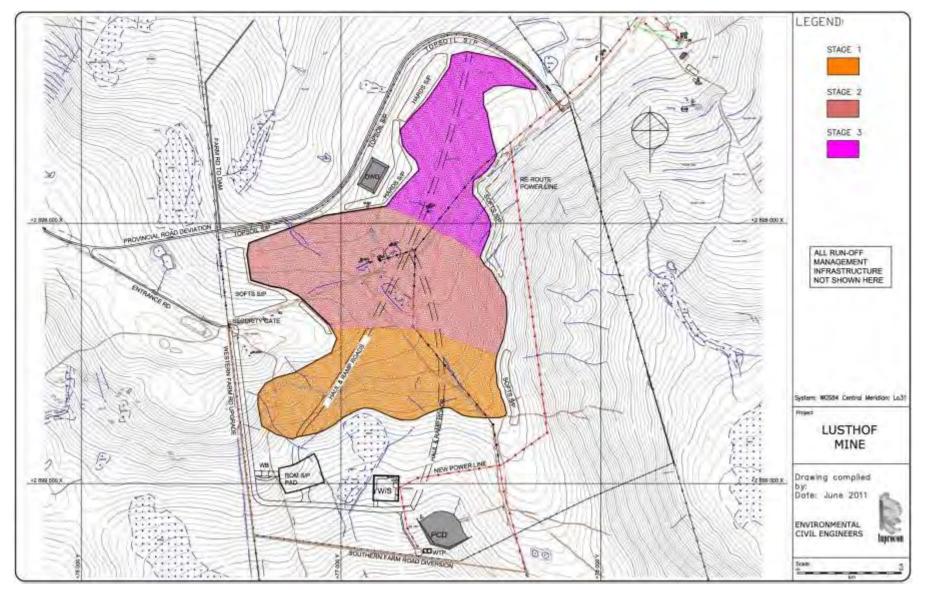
(a): General Infrastructure Layout Plan.
